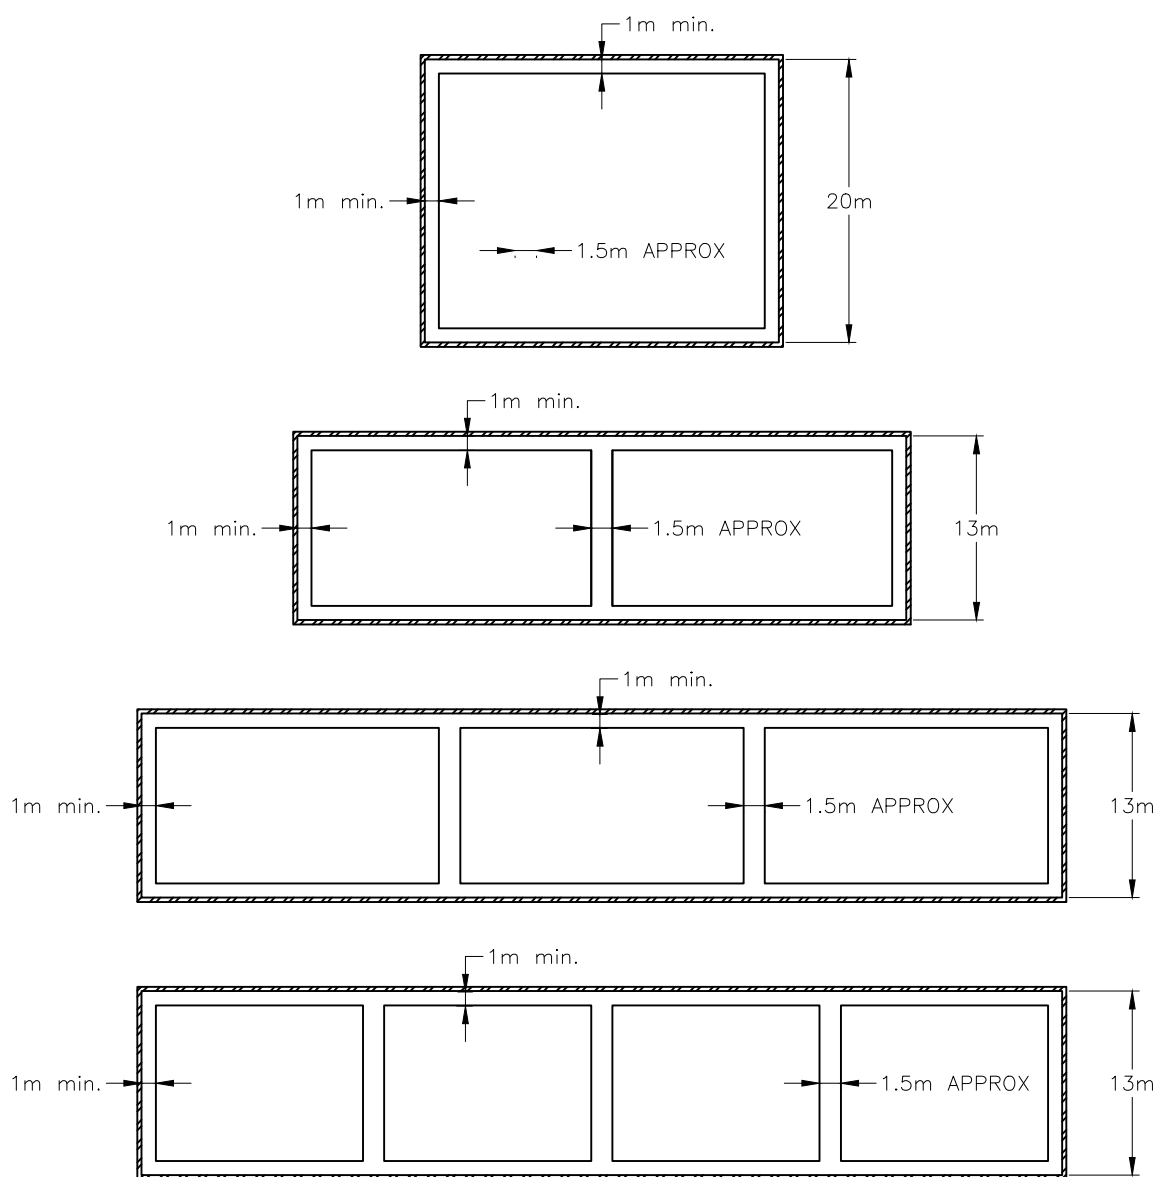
RECOMMENDED STACKING ARRANGEMENTS FOR 13 AND 20 METRE SPANS
